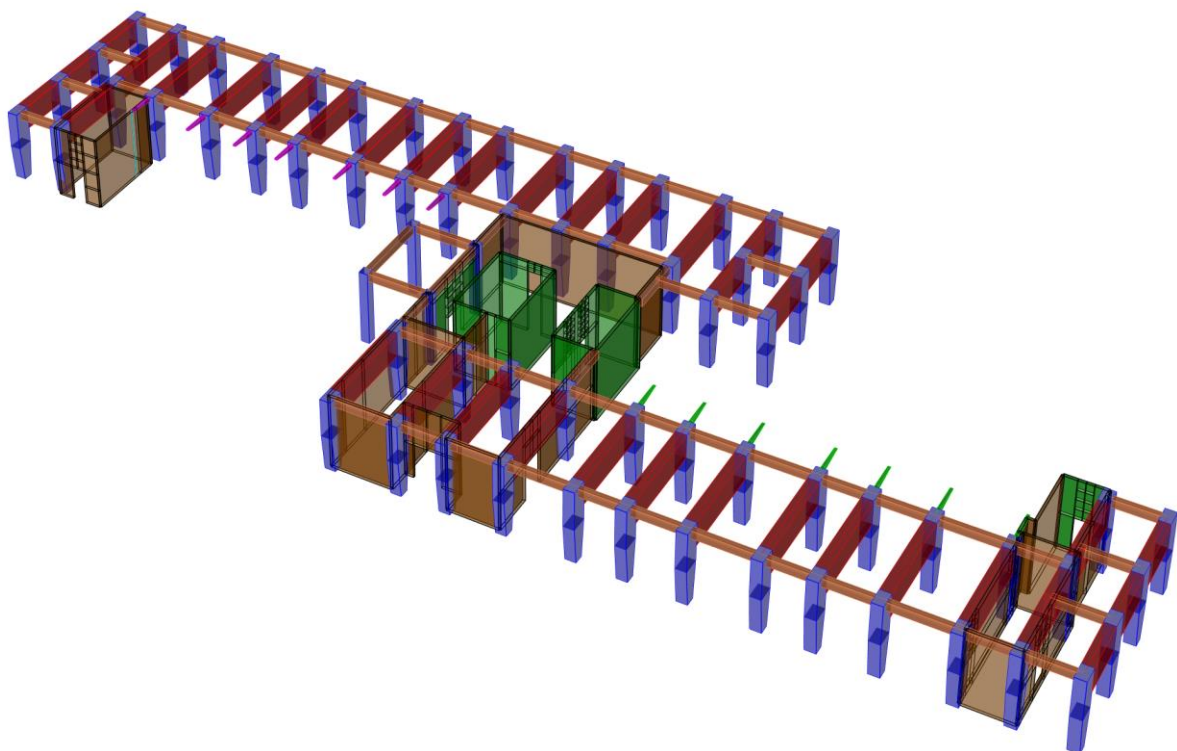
Isometric view of level 1 (concrete floor panels hidden from view for clarity) Indicating walls which continue through to foundation level and transfer beams spanning in the north-south and east-west directions.
